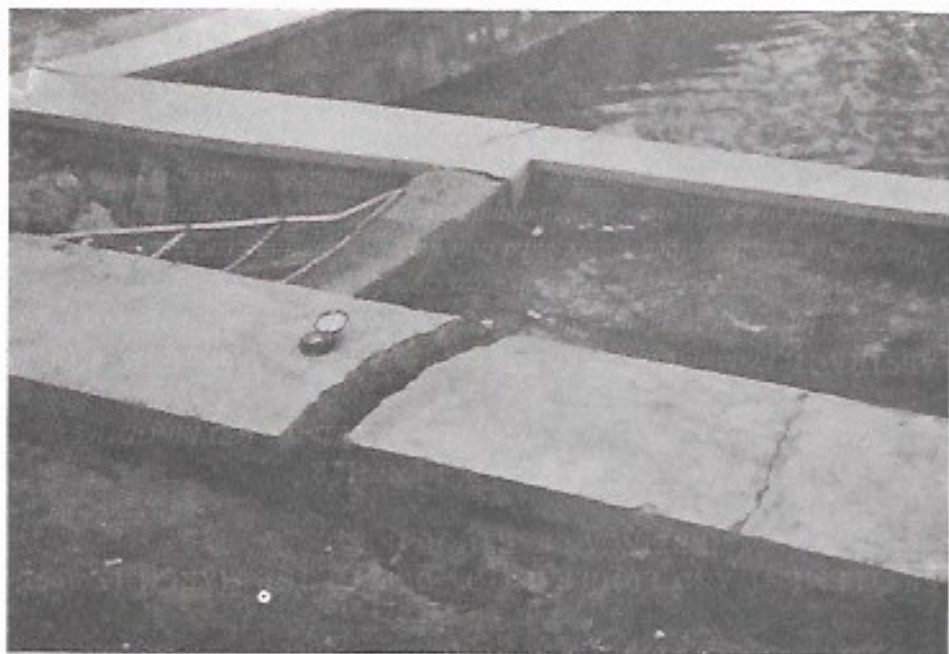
Lateral translation caused fracturing of retaining wall with associated tension crack in backfill.
